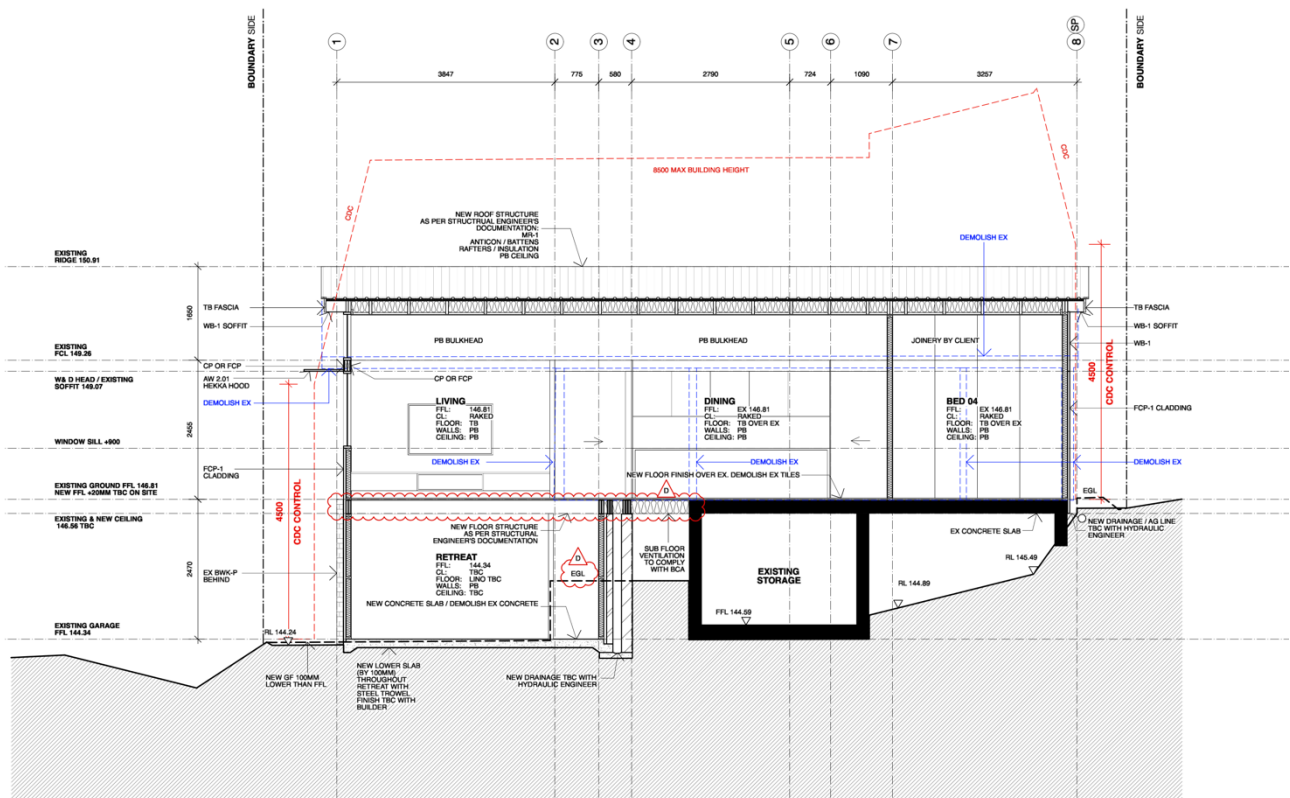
CDC Section AA 11 Jones Street, Beacon Hill
